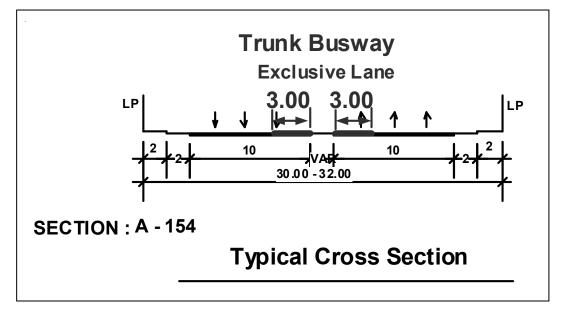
Typical Cross Section of Trunk Busway on Arterial road (Av. Universitaria)
